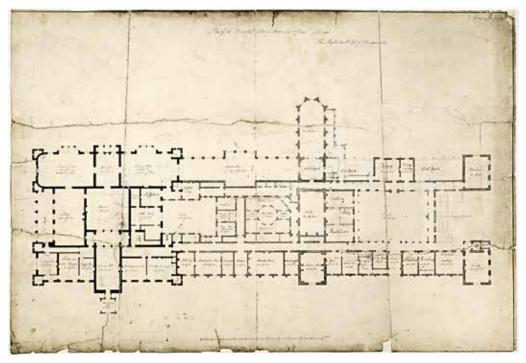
Plan of the principal floor of the house and offices at Ashridge House, Wyatt office drawing, c. 1808; the entrance (facing north) is at the bottom (RIBA Collections)
